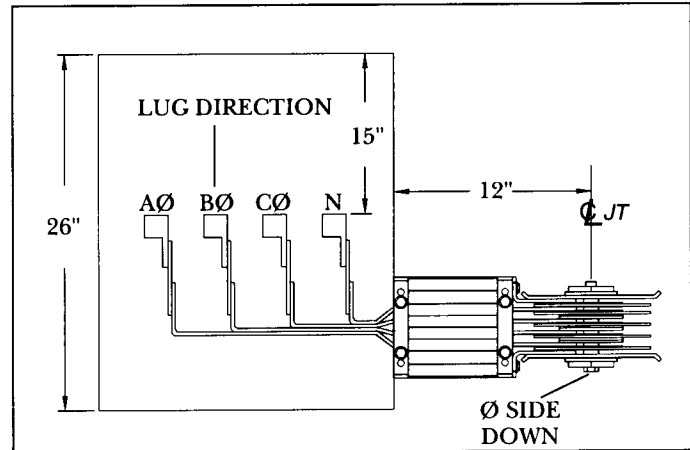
Inverted End Tap Box Up Position, Side View
